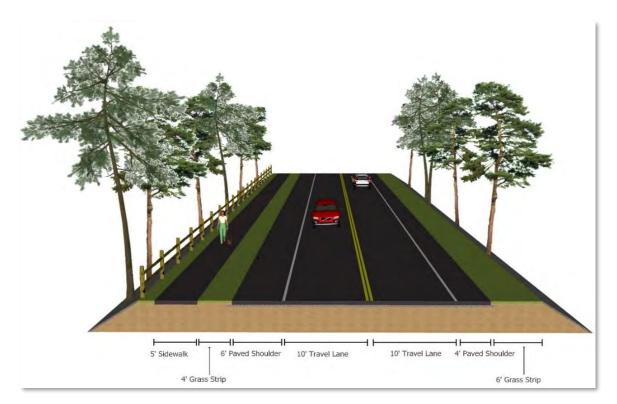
Cross-Section Between I-40 Bridge And Windy Woods Road
